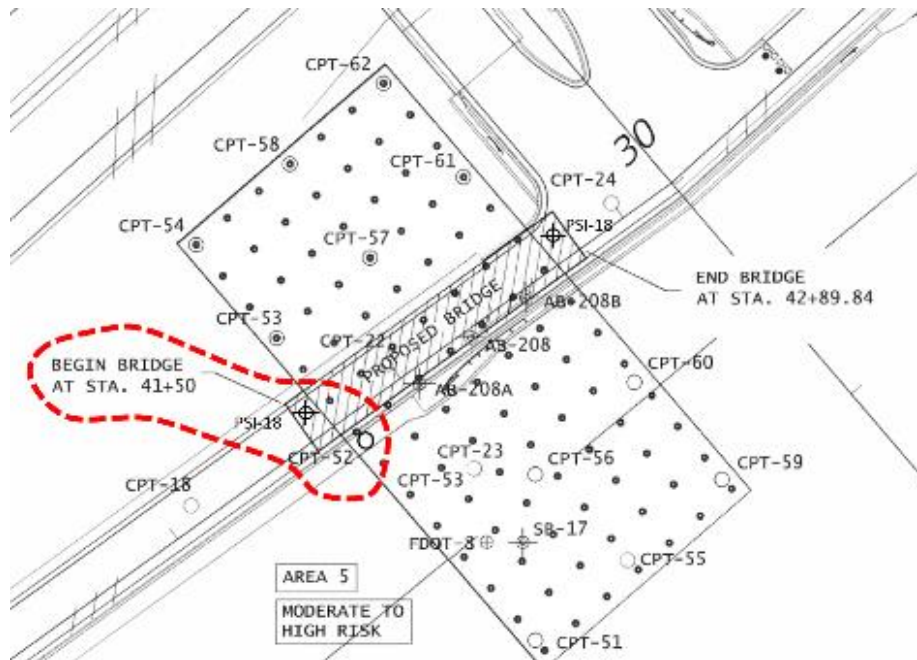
Site layout of SR-46 connector bridge over SR-429
